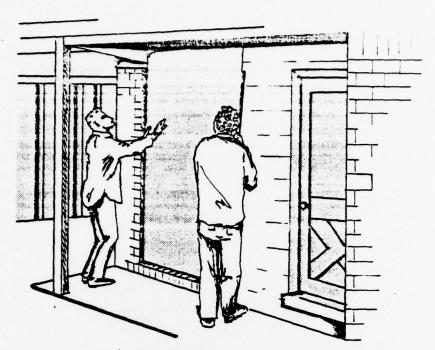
PLACING BOARDS OVER EXTERIOR WALL APERTURES.
